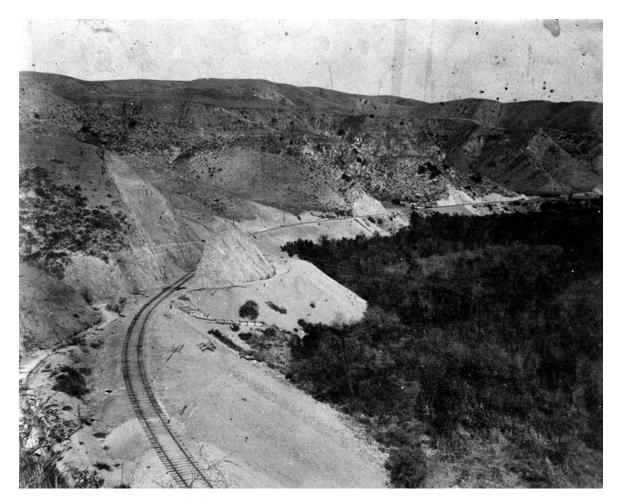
Atchison, Topeka & Santa Fe Railroad Tracks when First Laid in Horseshoe Bend, East of the Project Footprint, 1887 (LAPL 1887)
